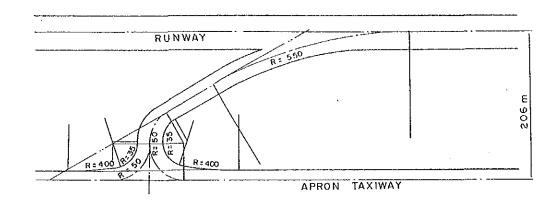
Layout Plan of New High-speed Exit Taxiway
